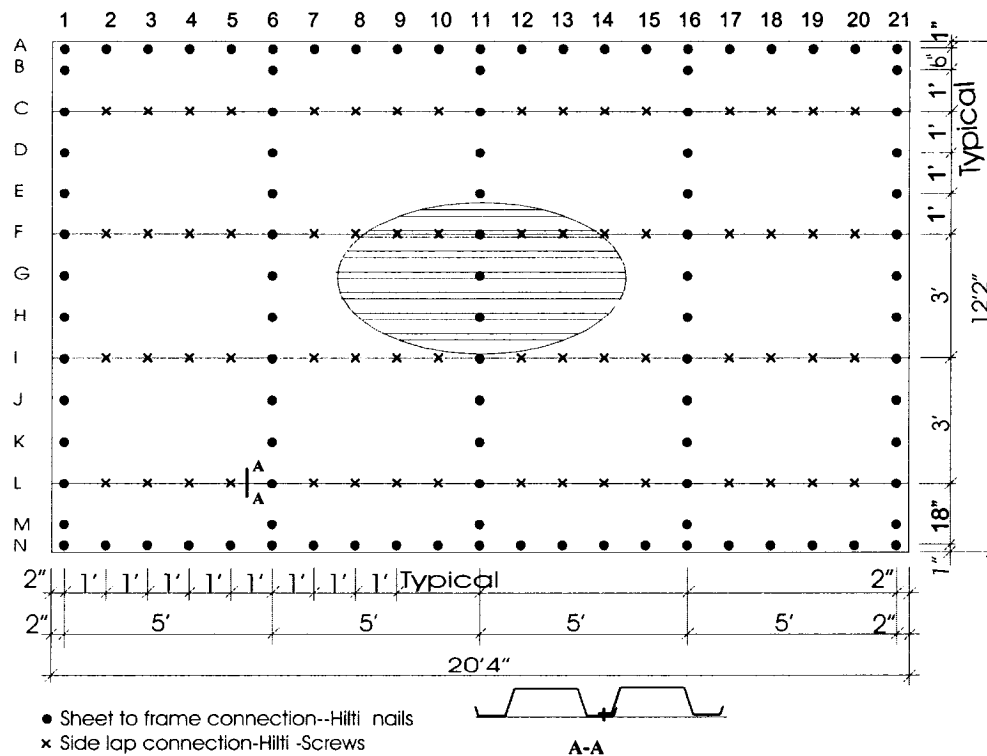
Plan of Group 3 test layout (Yang, 2003)
